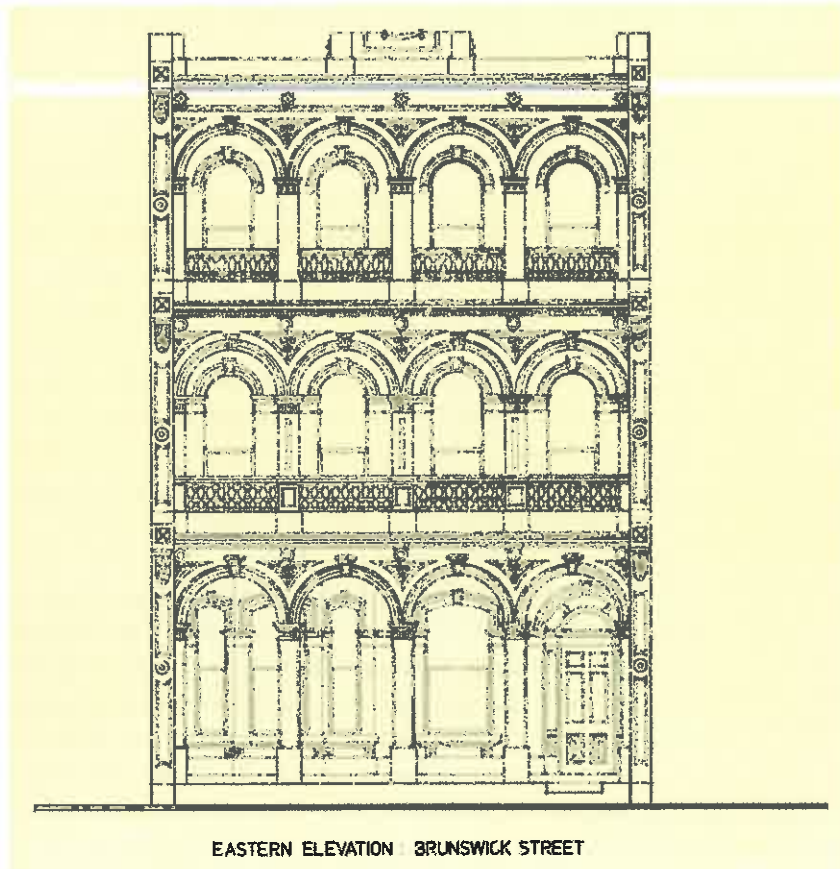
1977 measured drawing of the street facade showing the truncated parapet.
